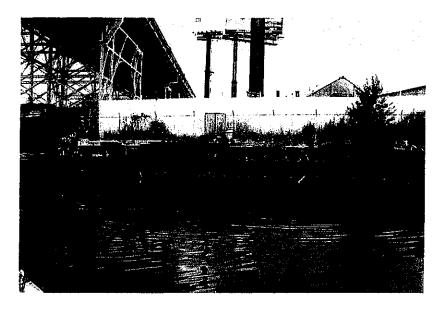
SOUTH PORTION OF TIMBER BULKHEAD
